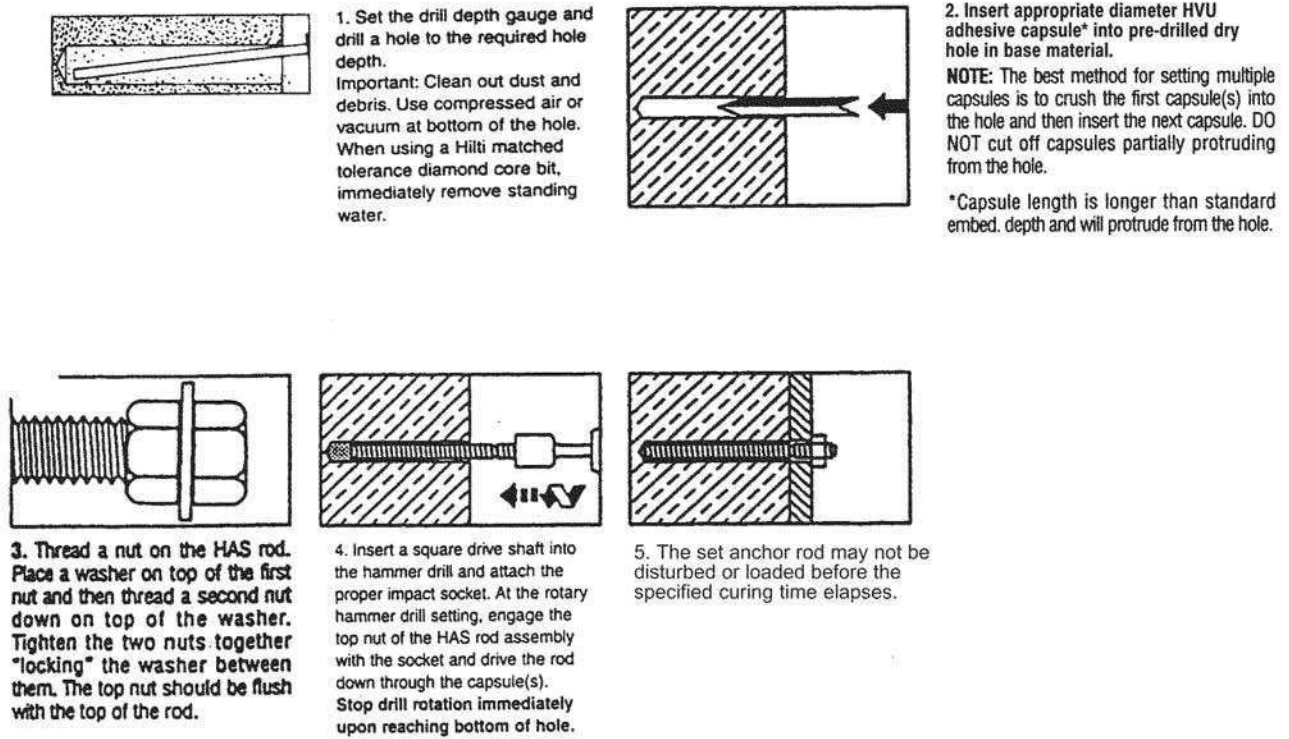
THE HILTI HVA ADHESIVE ANCHORING SYSTEM—INSTALLATION INSTRUCTIONS FOR HAS RODS
